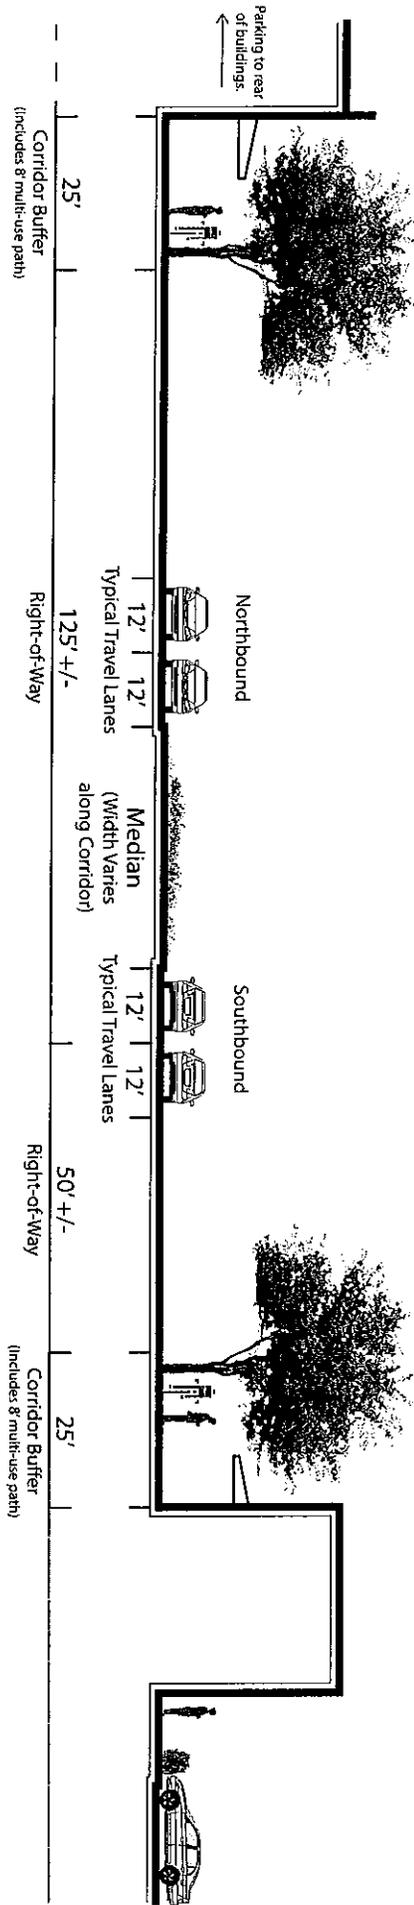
, Typical cross section along Highway Corridor Overlay District.
